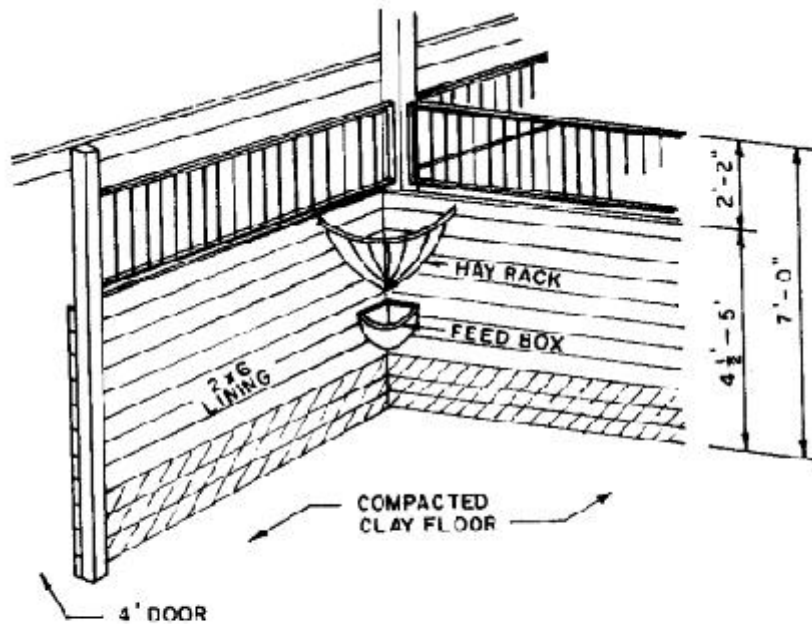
Typical box stall construction. The walls can be built of 2-inch planking or concrete blocks.
